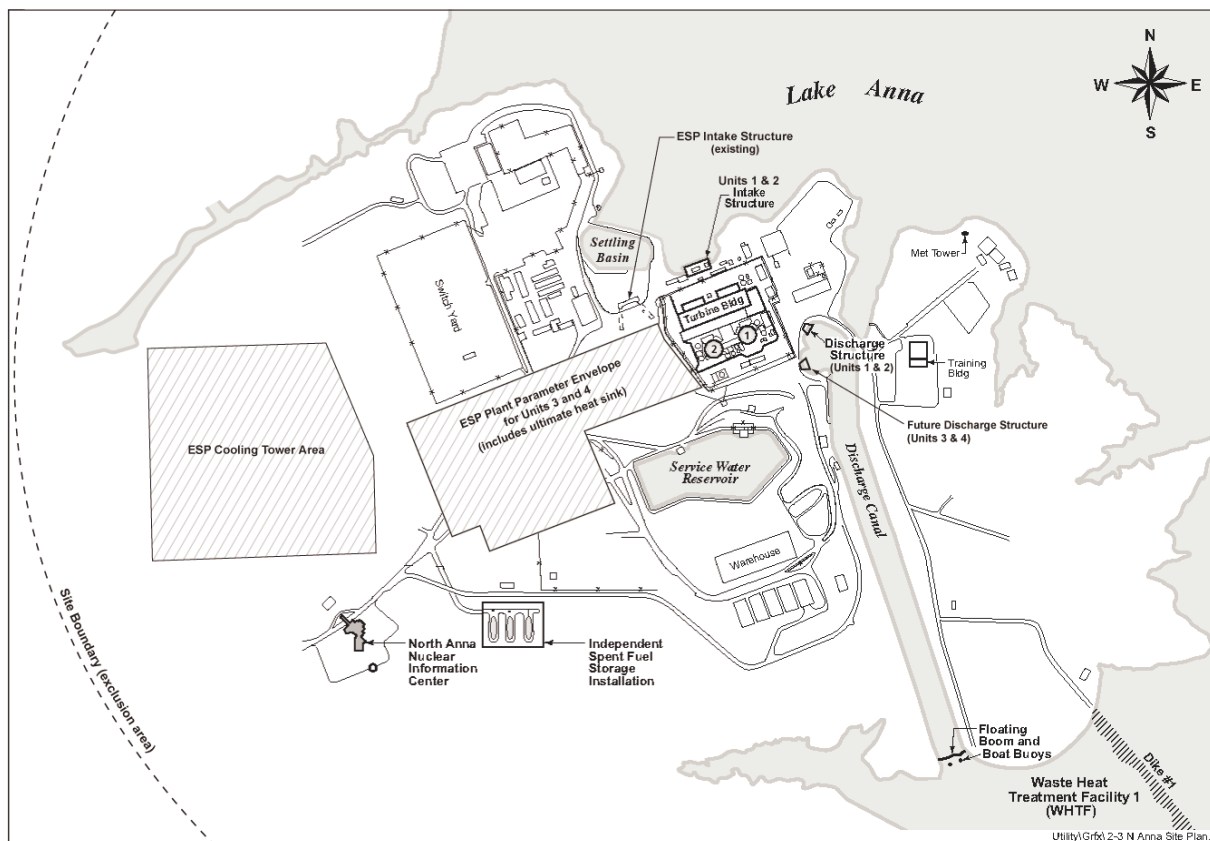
North Anna ESP Site Boundaries within the Existing NAPS Site
